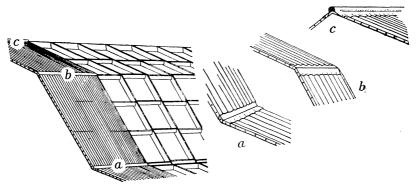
Corrugated metal roof without sheathing: a, Eaves joint; b, hip; c, ridge cap. Note how the headers are staggered to permit nailing through the rafters.
